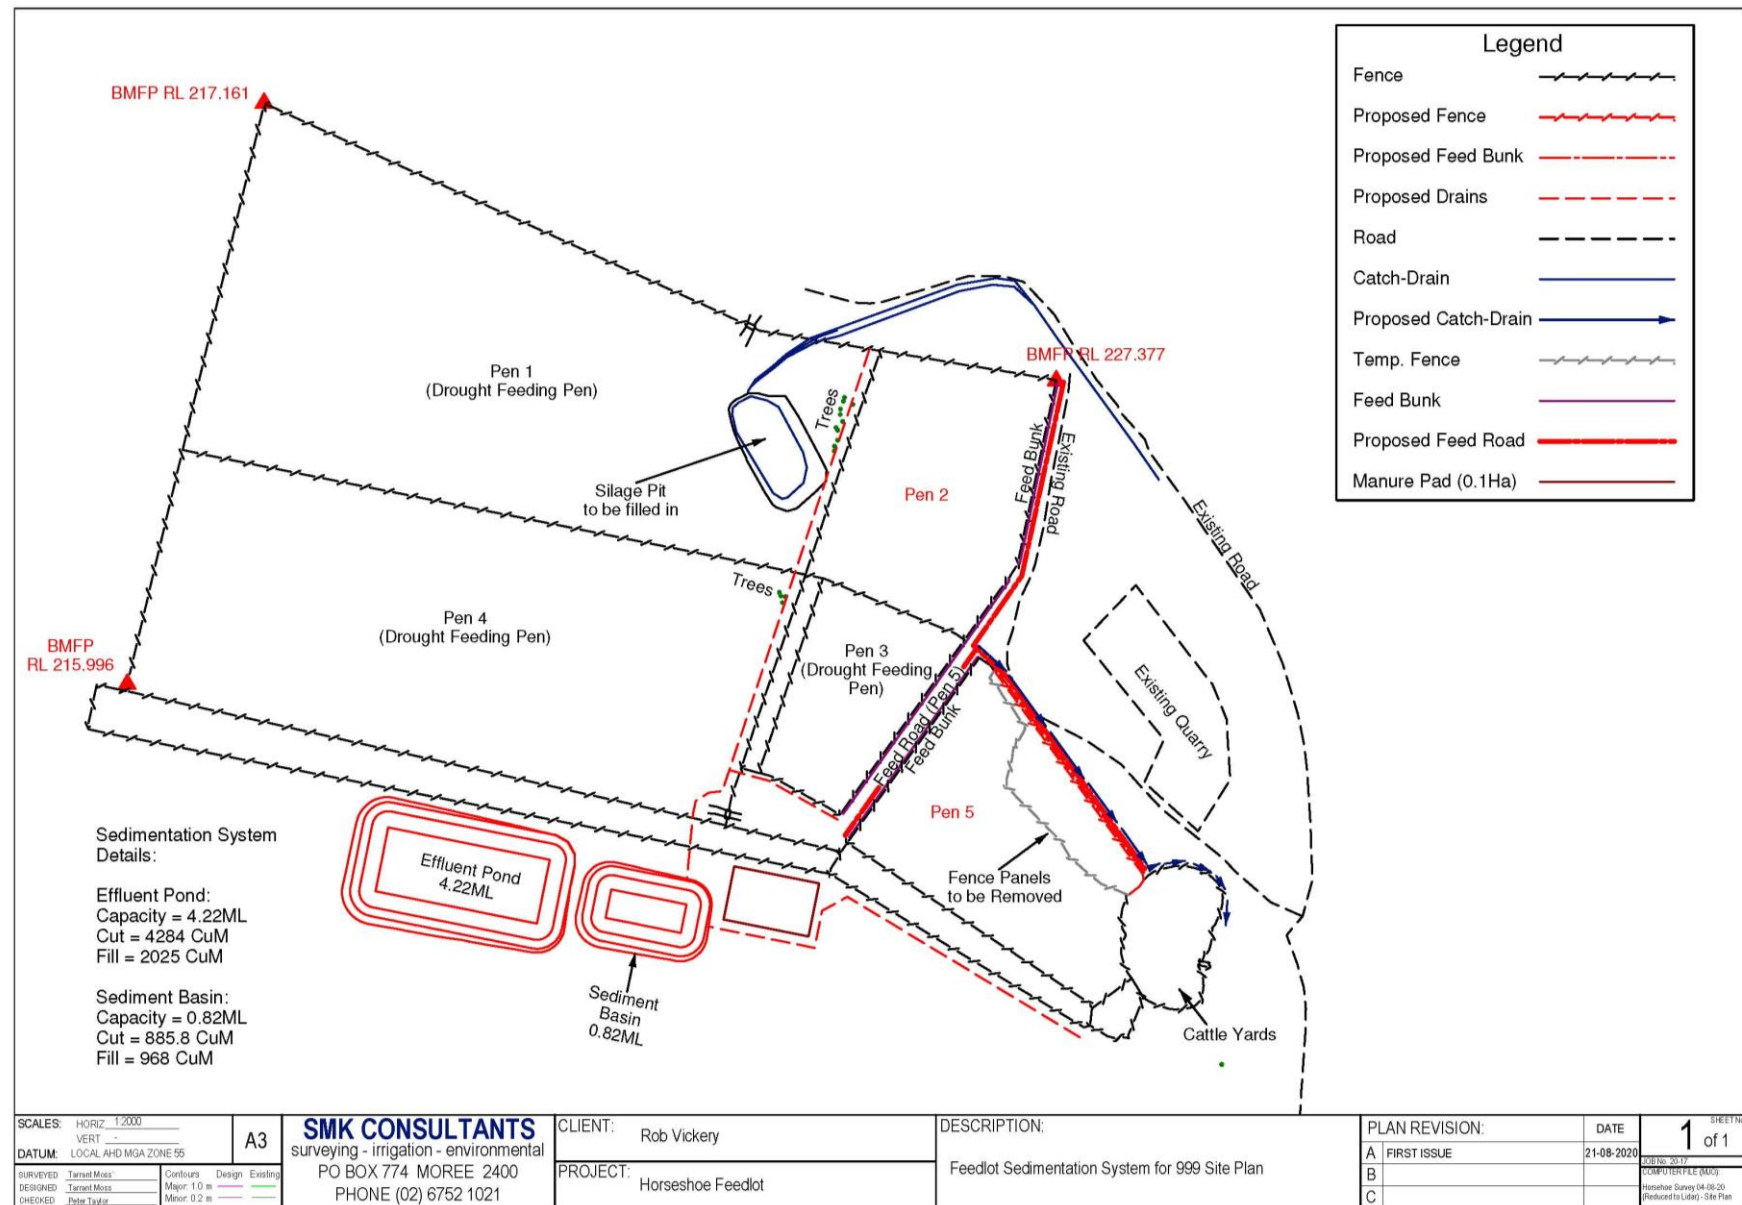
Proposed Site Plan. Pens 2 and 5 are proposed feedlot pens. Pens 1,3 and 4 will continue to be utilised as temporary containment pens.
